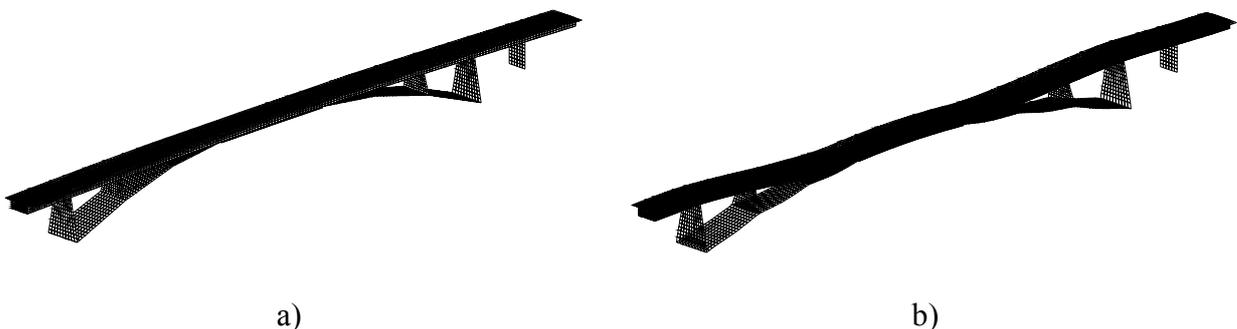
a) Finite element shell model; b) Deformed bridge under dead weight
